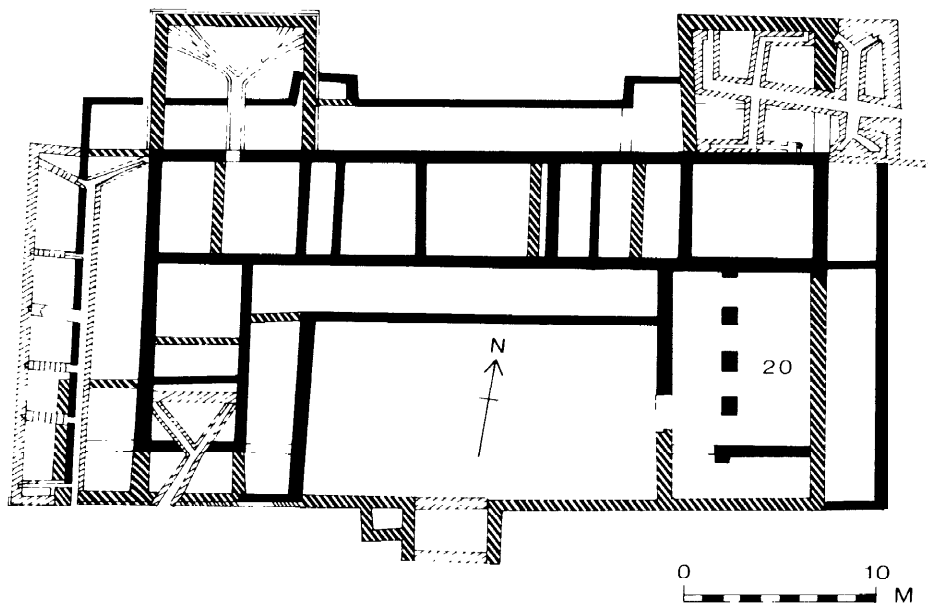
Gadebridge Park villa, Herts. Groundplan (D S Neal)
